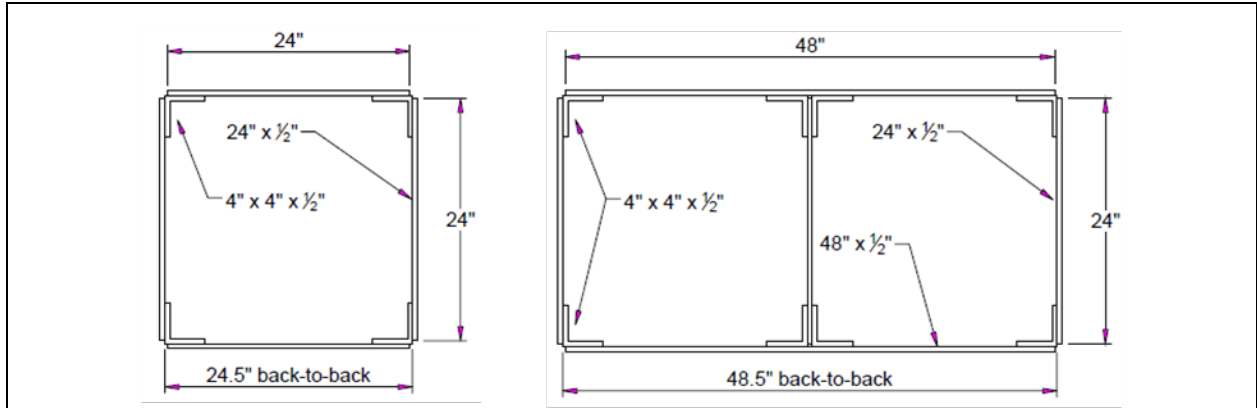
Cross-sections of pier / arch columns and skewback columns.
